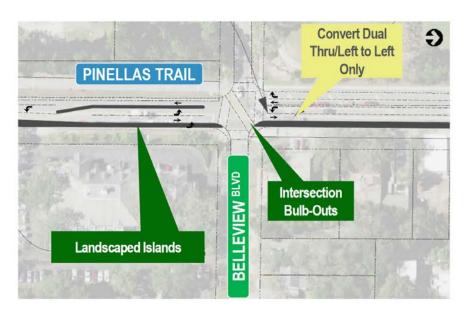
Road Diet Concept Plan Belleview Boulevard Intersection
